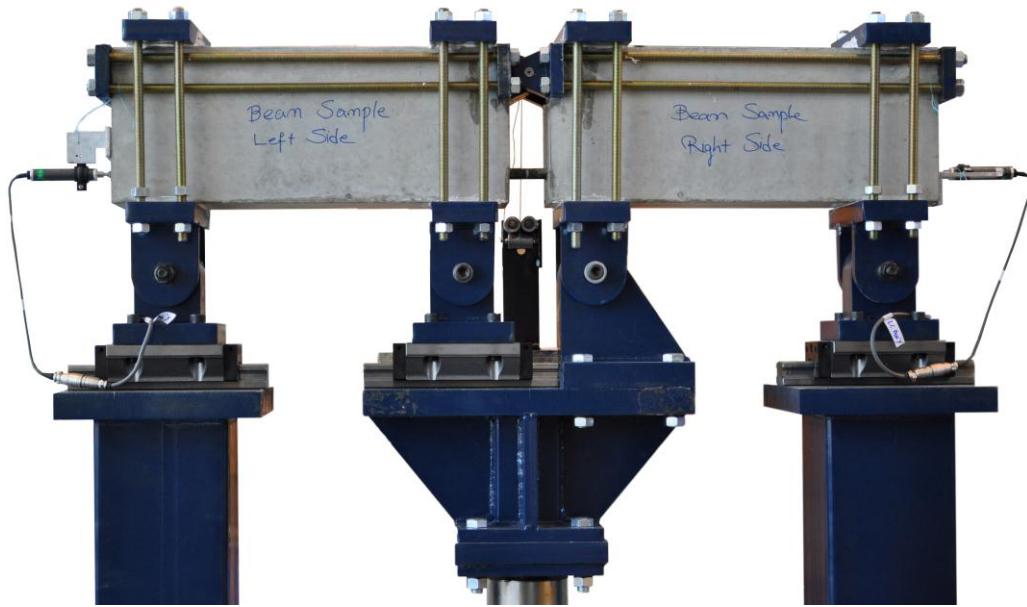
Details of the proposed cyclic test setup and modified RILEM beam specimen
